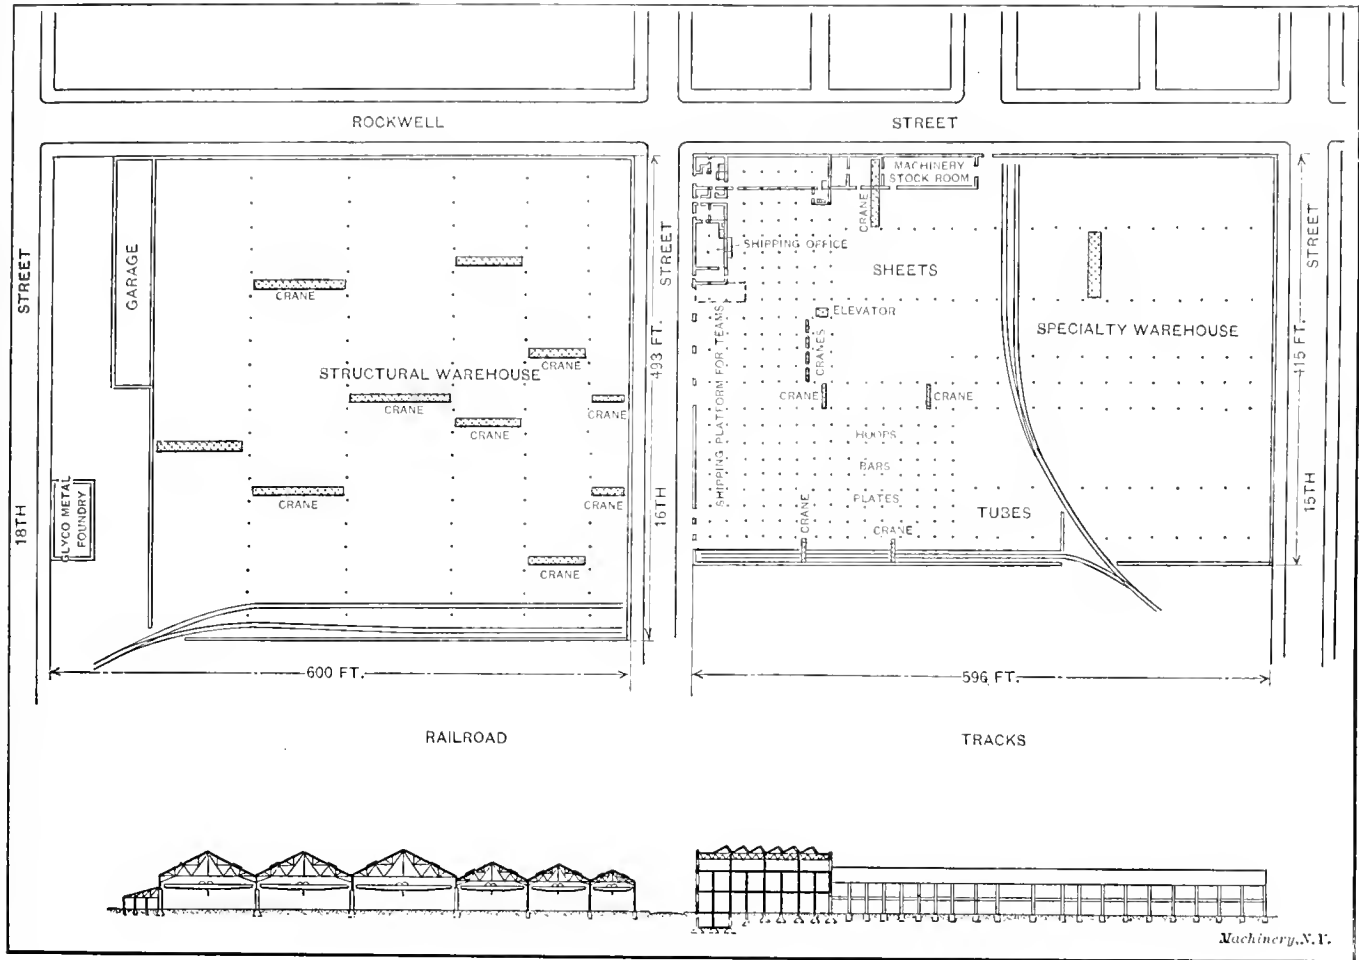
Ground Plan of the Warehouse of Joseph T. Ryerson & Son, Chicago, Ill.
